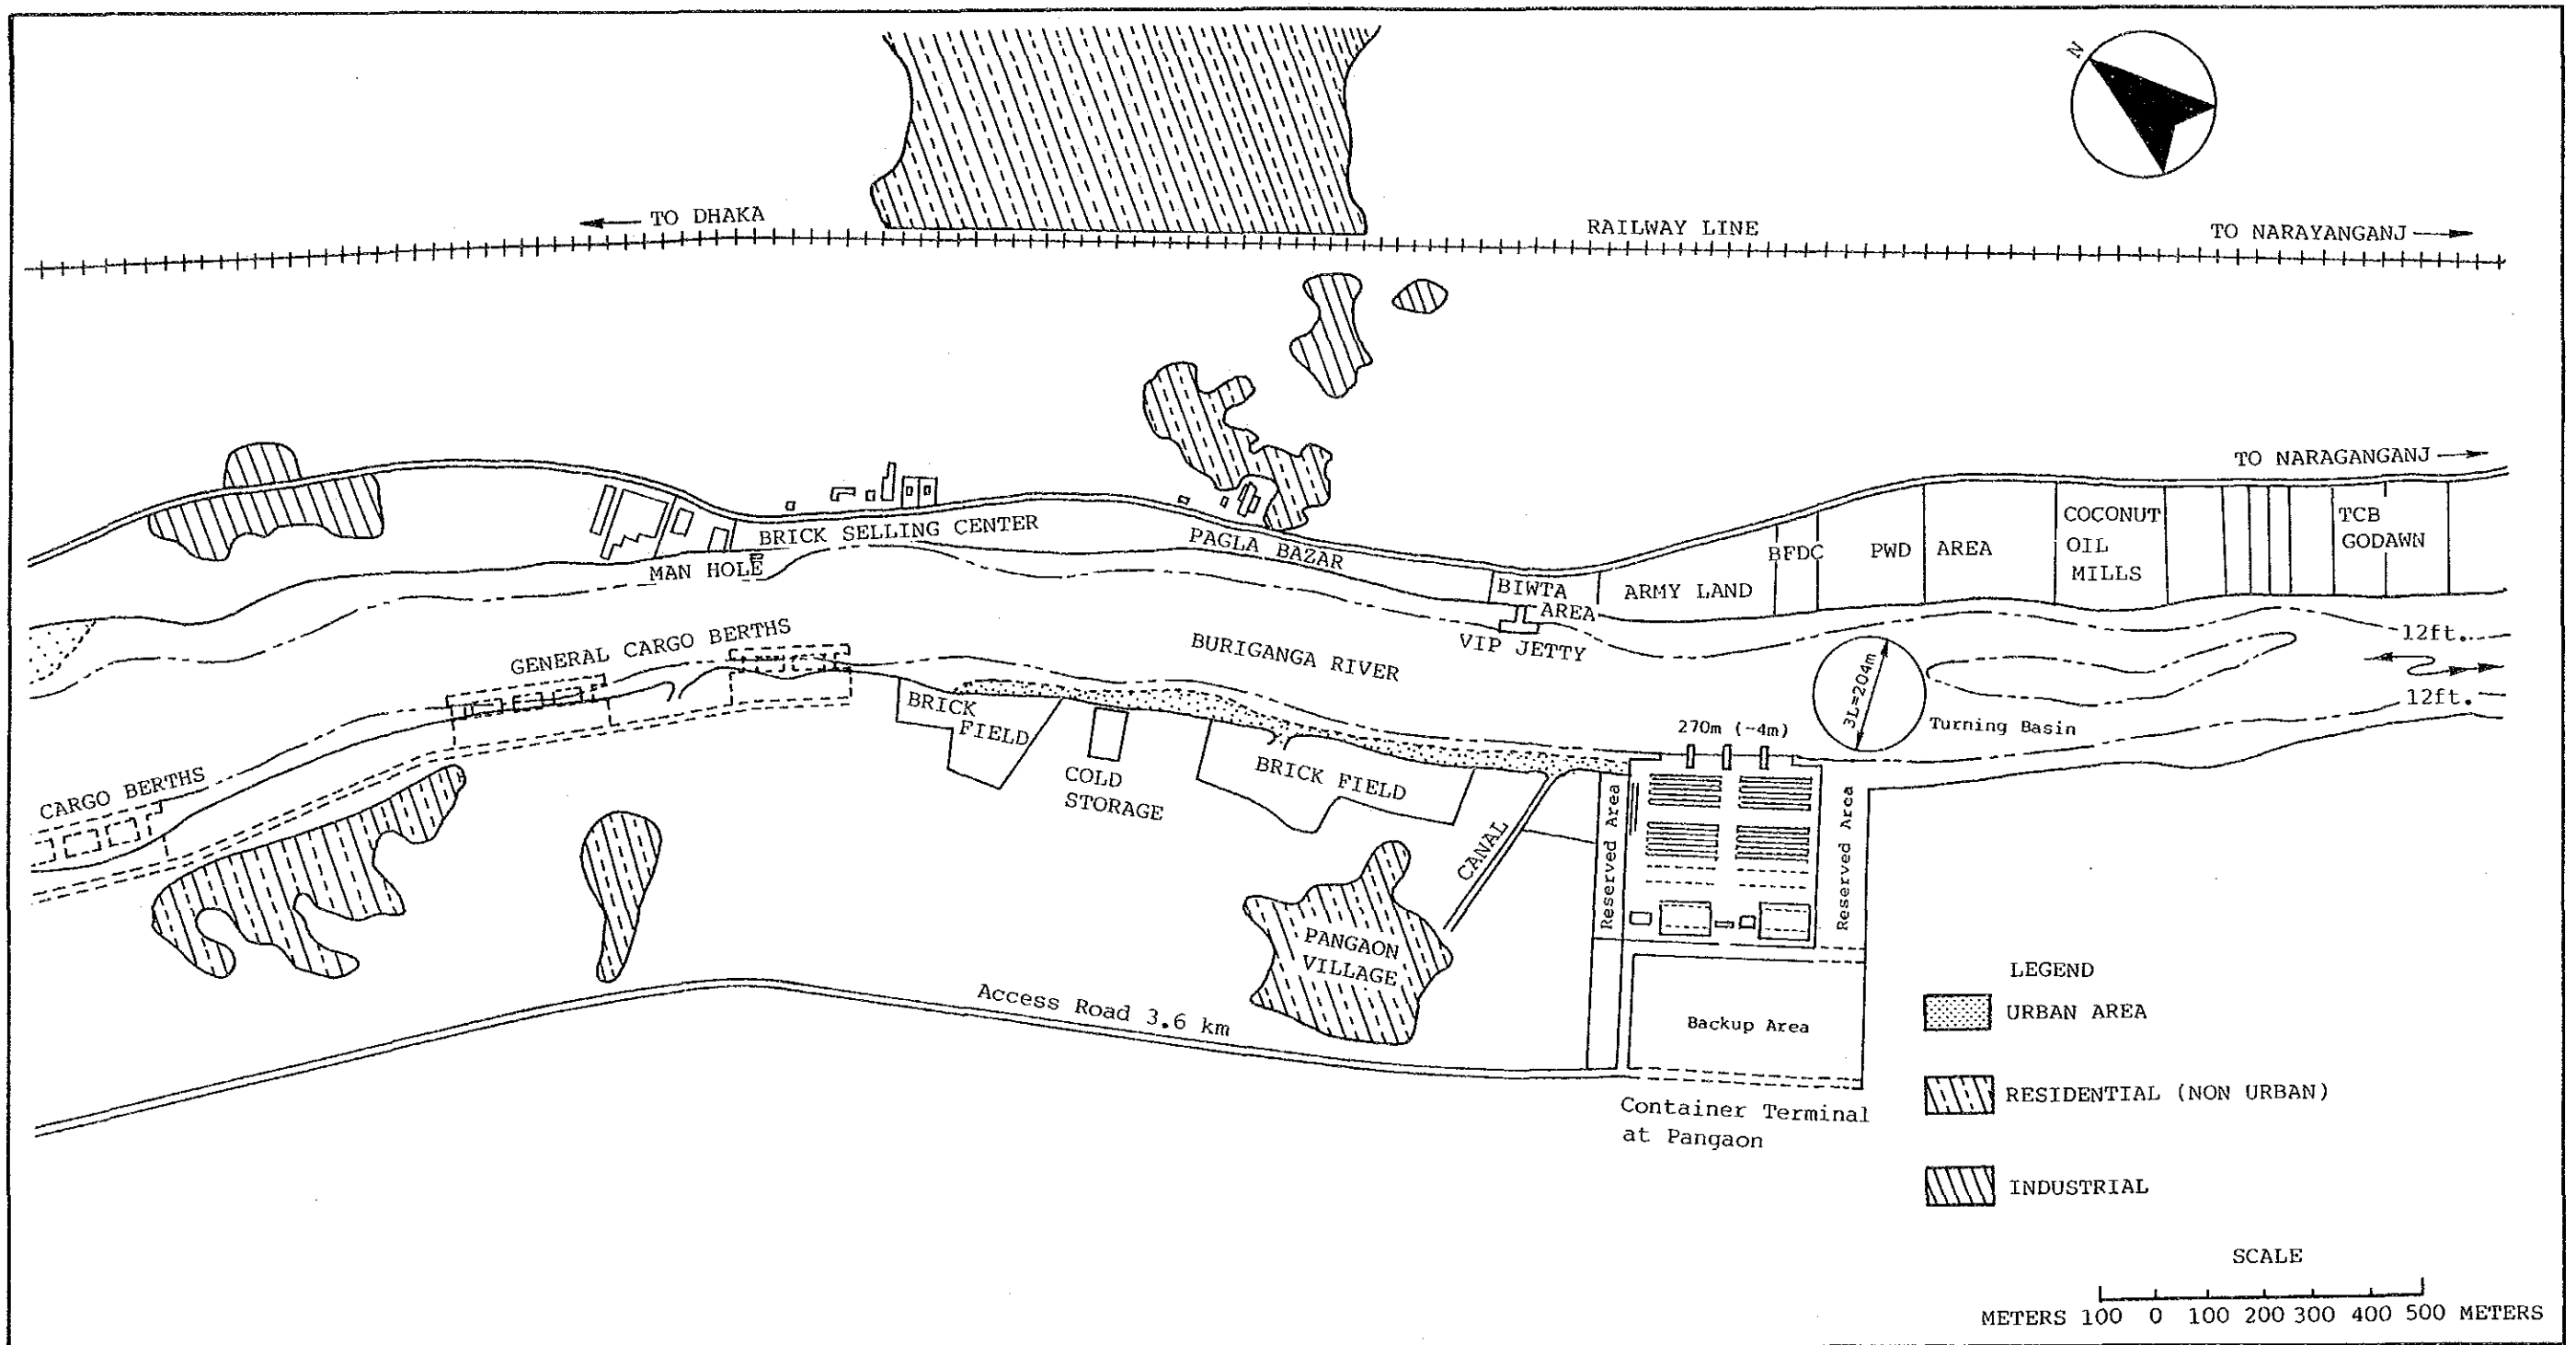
Alternative Development Plan at Pangaon Site - Case 1
